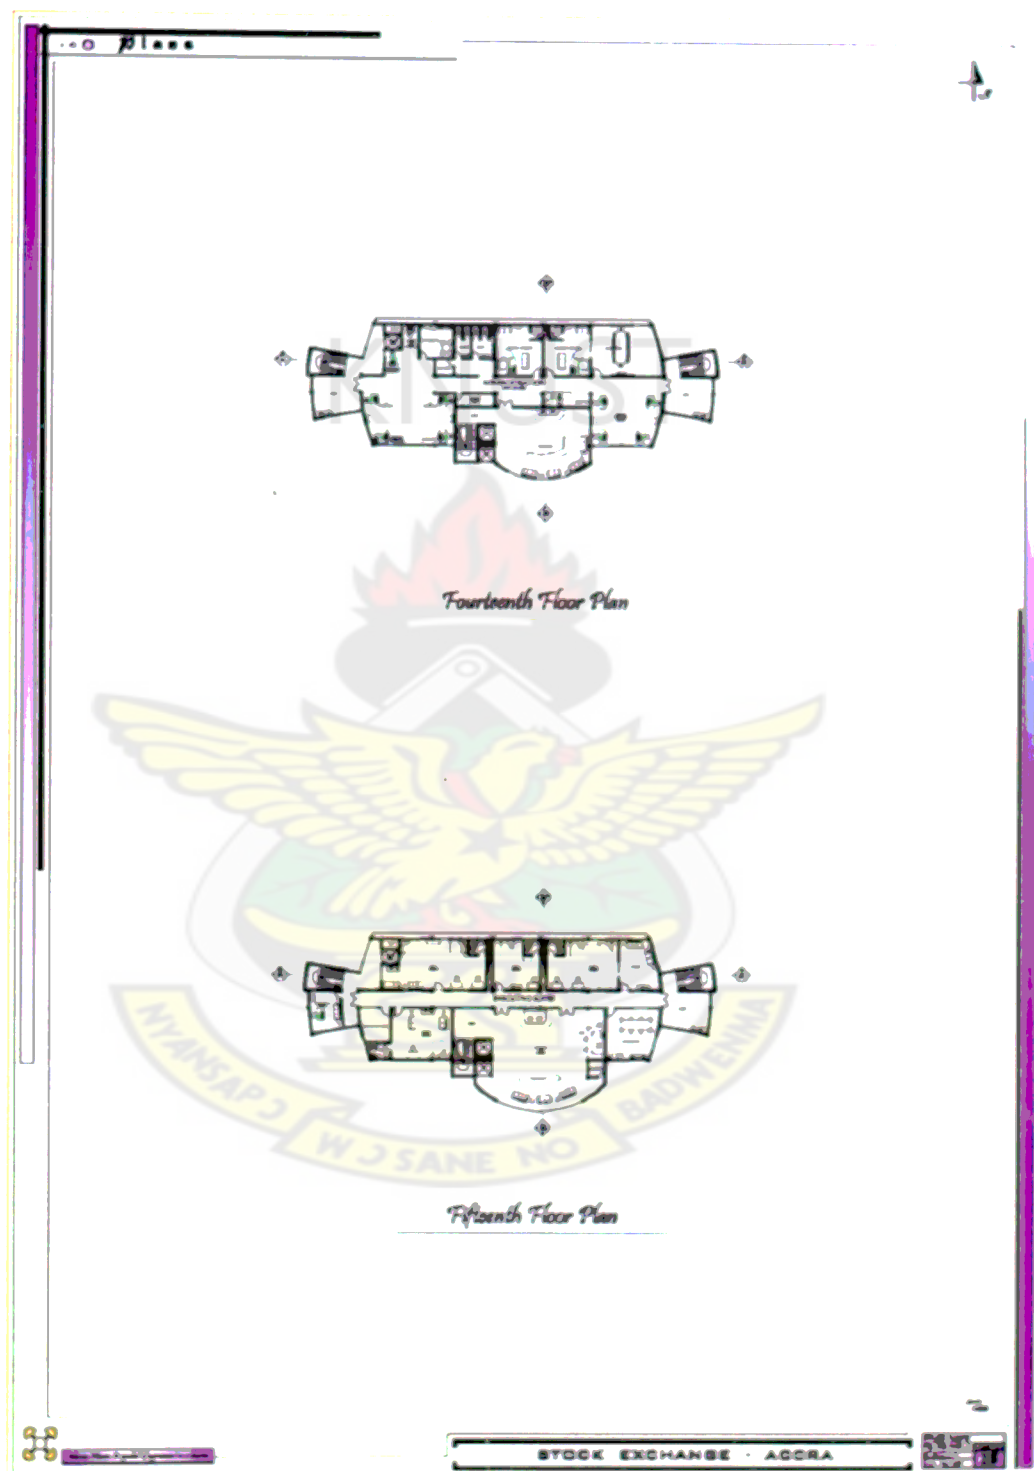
Fourteenth floor plan and Fifteenth floor plan
